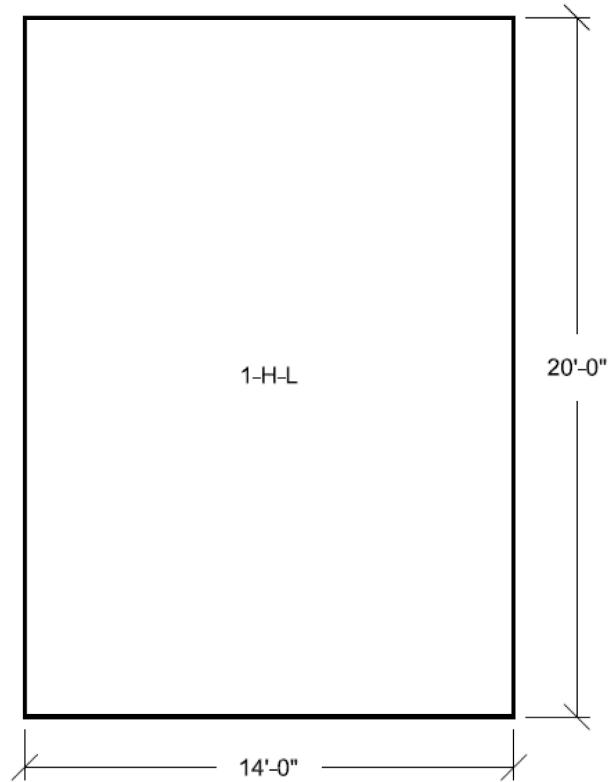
H.6-175 DGFOSV Wall 9 Looking From Outside Horizontal Reinforcement Zones Far Side Face
